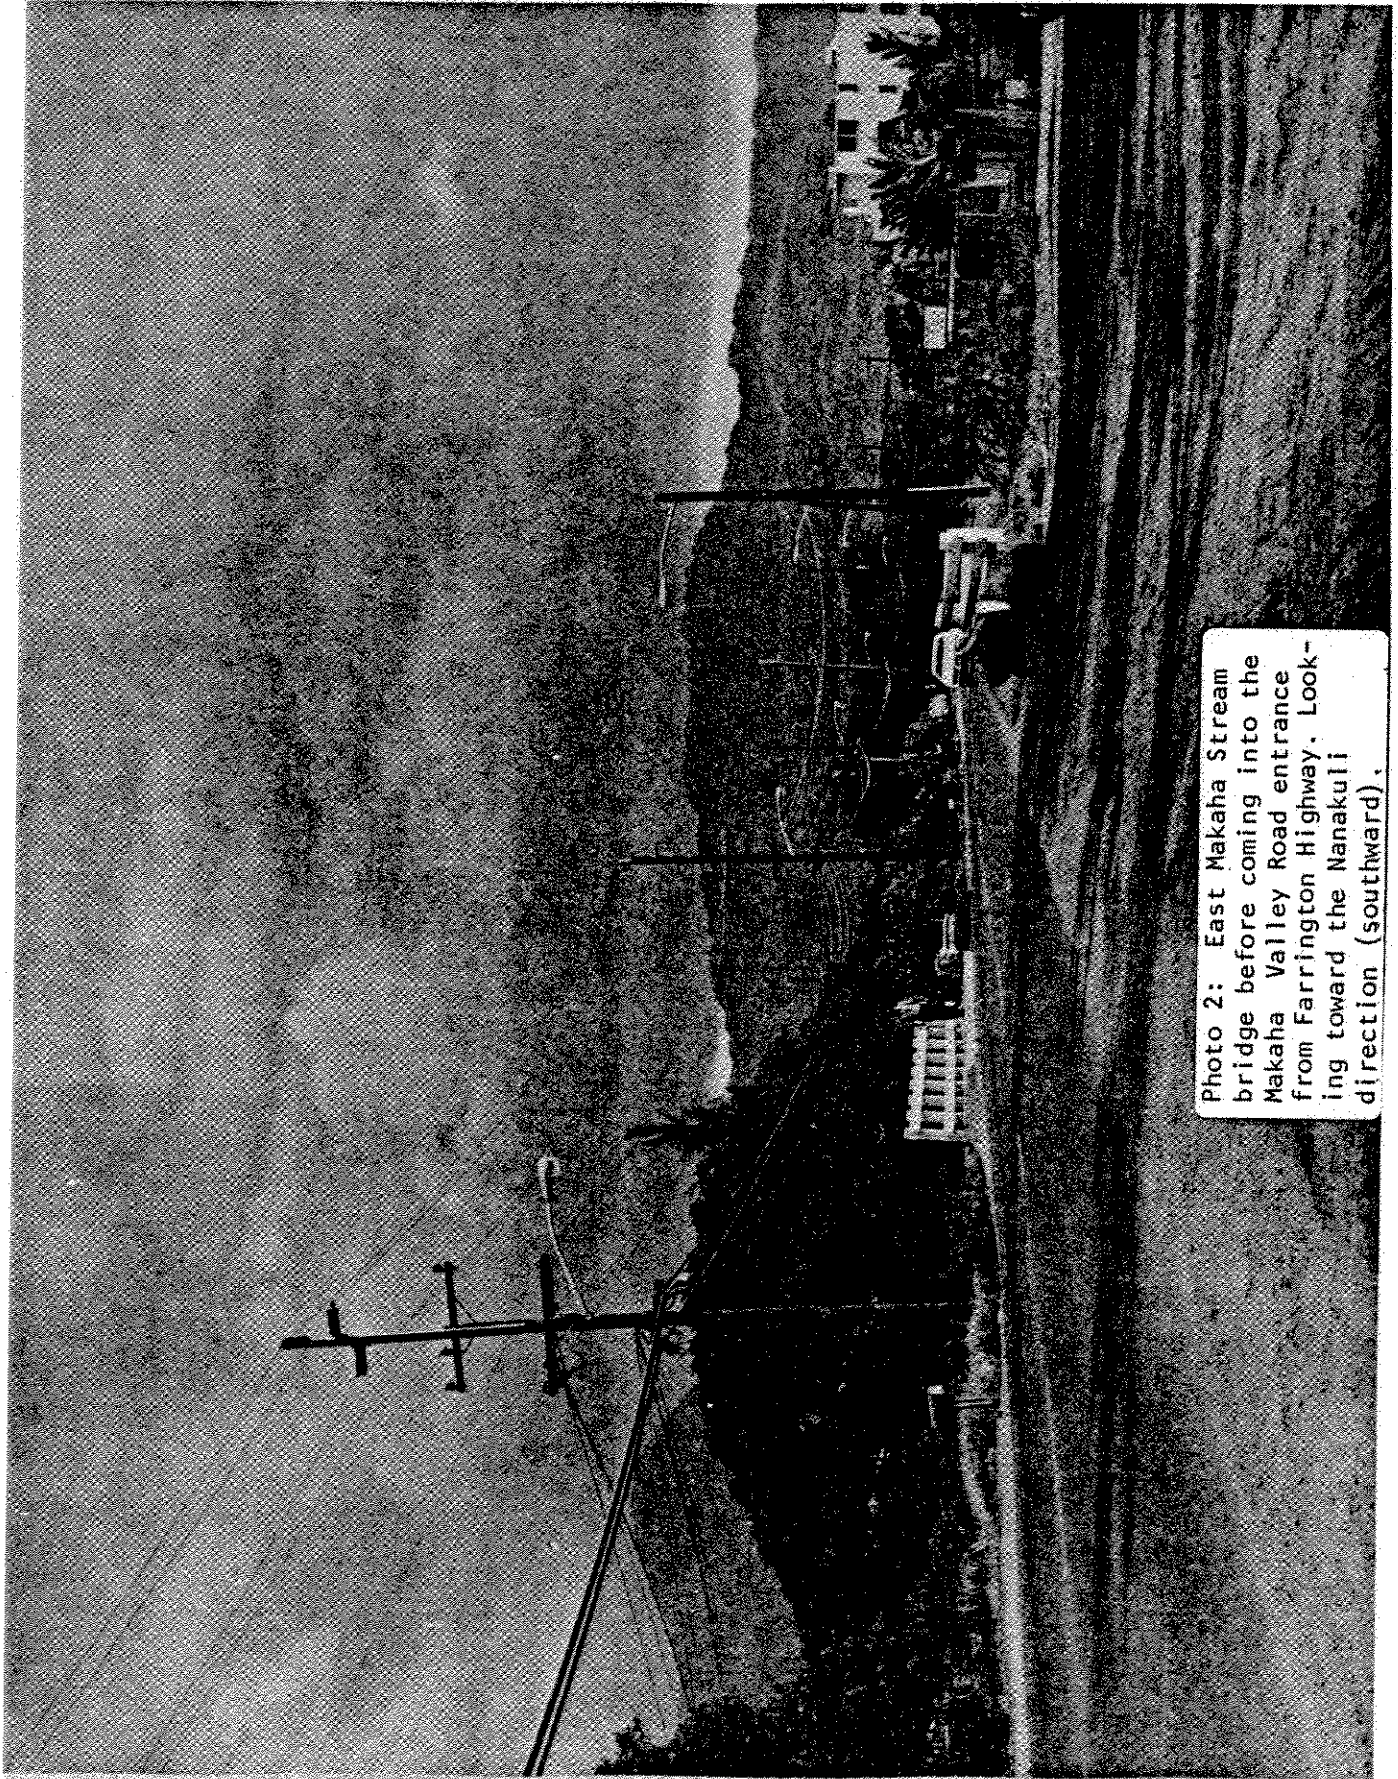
East Makaha Stream bridge before coming into the Makaha Valley Road entrance from Farrington Highway. Looking toward the Nanakuli direction (southward).
